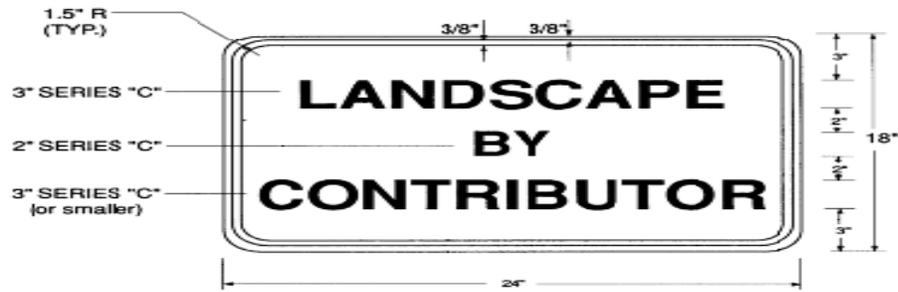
Arterial and Limited Access Landscape Roadway Sign
